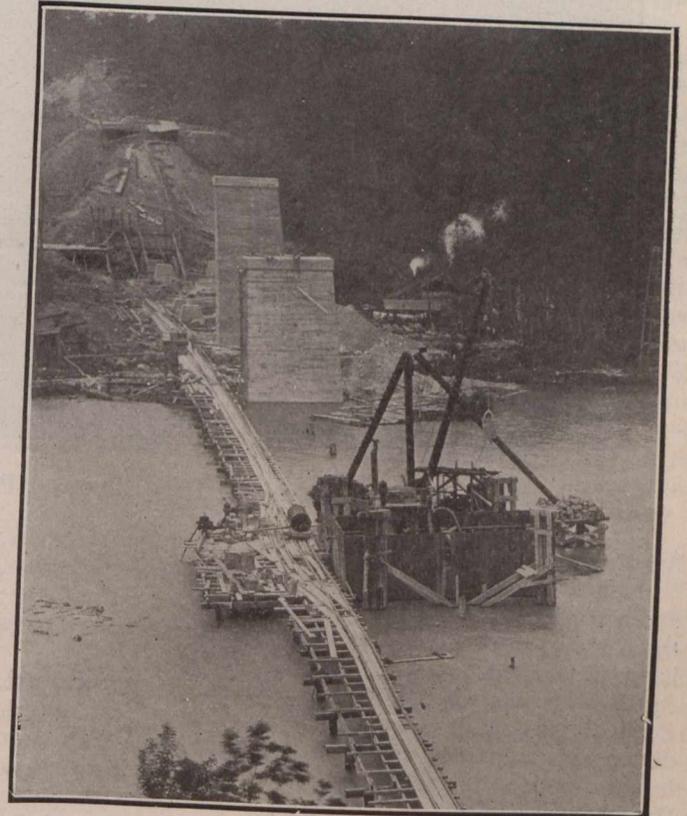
Caisson for Pier No. 2 Being Sunk.
